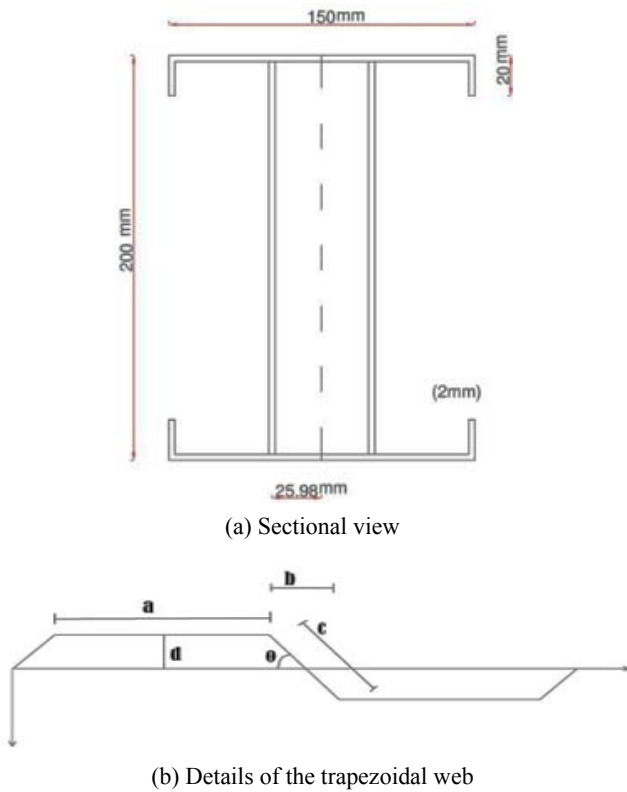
Dimensional details of the CFS double trapezoidal webbed beam specimen
